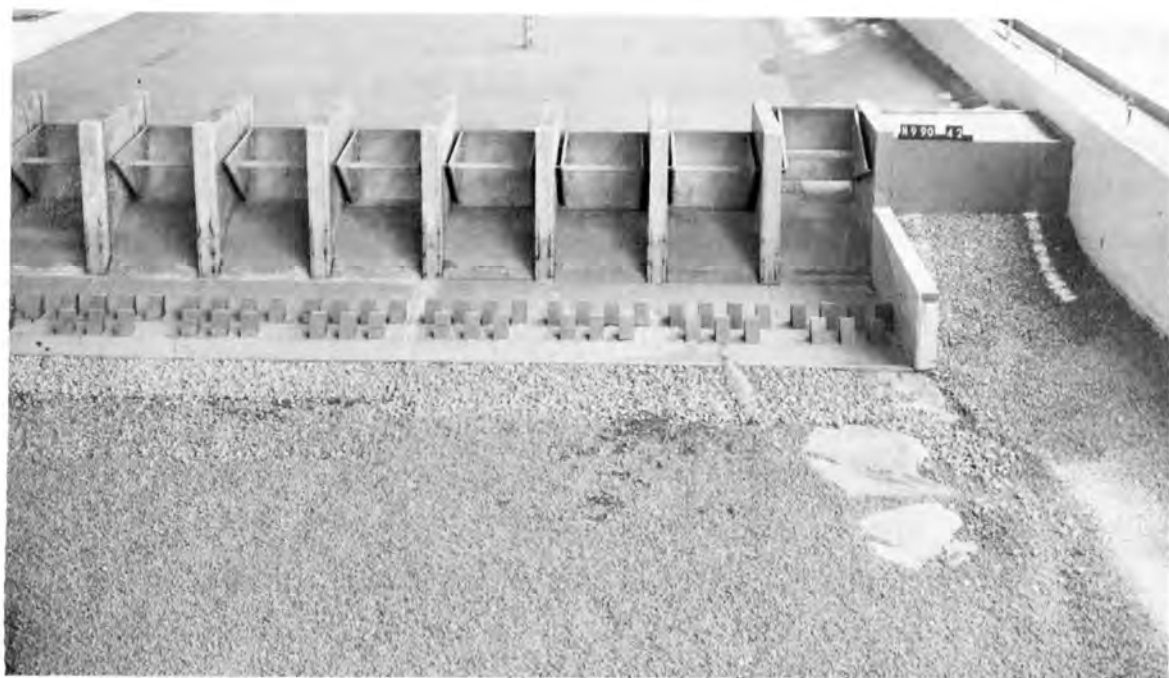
Type 17 stilling basin (without pier extensions) with one gate half open, pool elevation of 40.0, tailwater elevation of 10.0. Note failure of 24- and 18-in.-thick riprap blanket after 15-hr (prototype) operation
